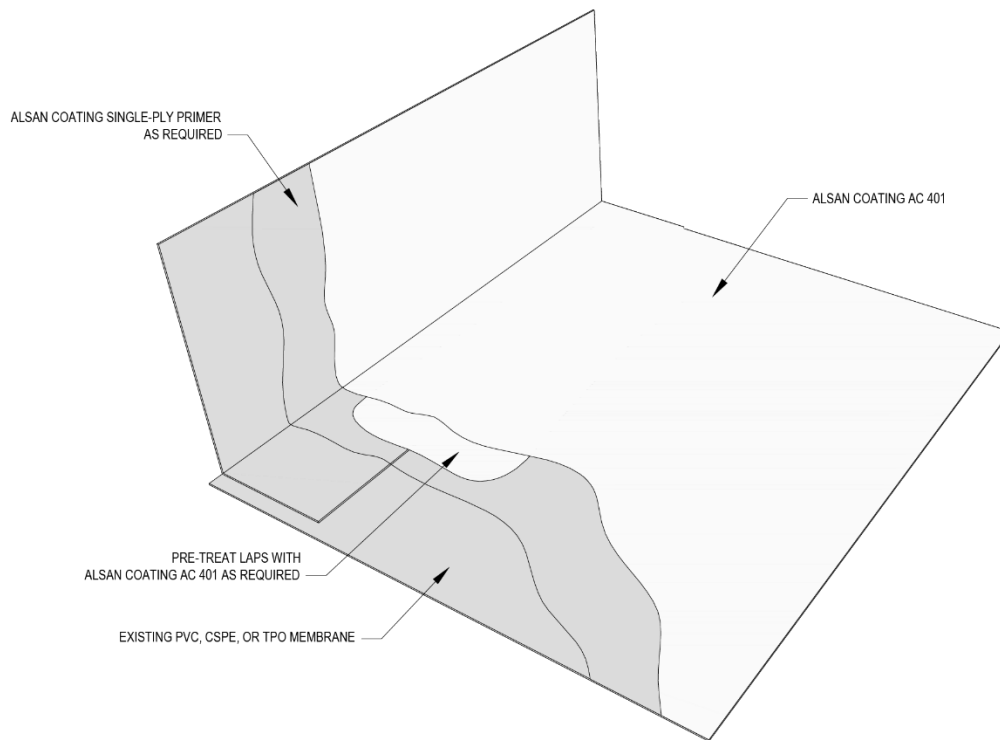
Acrylic Roof Coating Over TPO/CSPE/PVC, Wall/Curb
